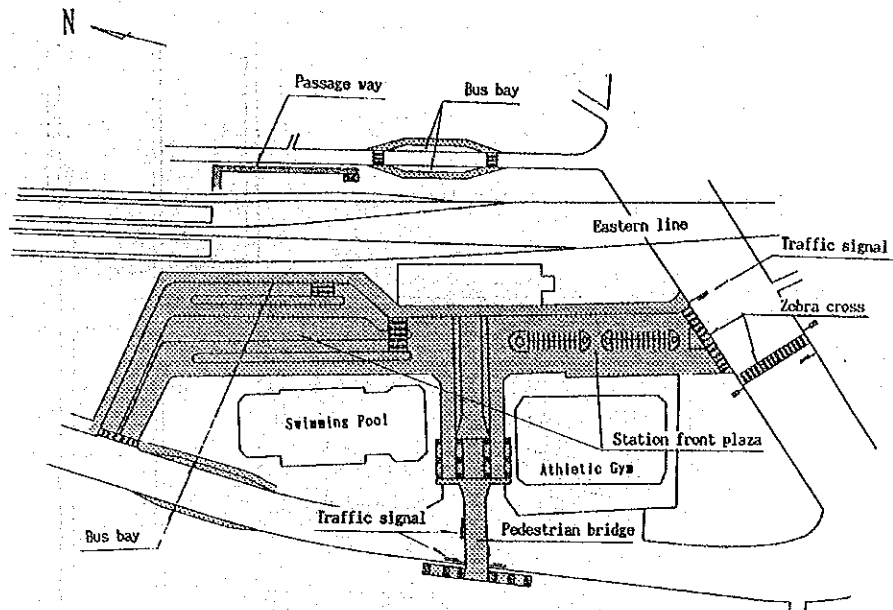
Pasar Senen Improvement Plan
